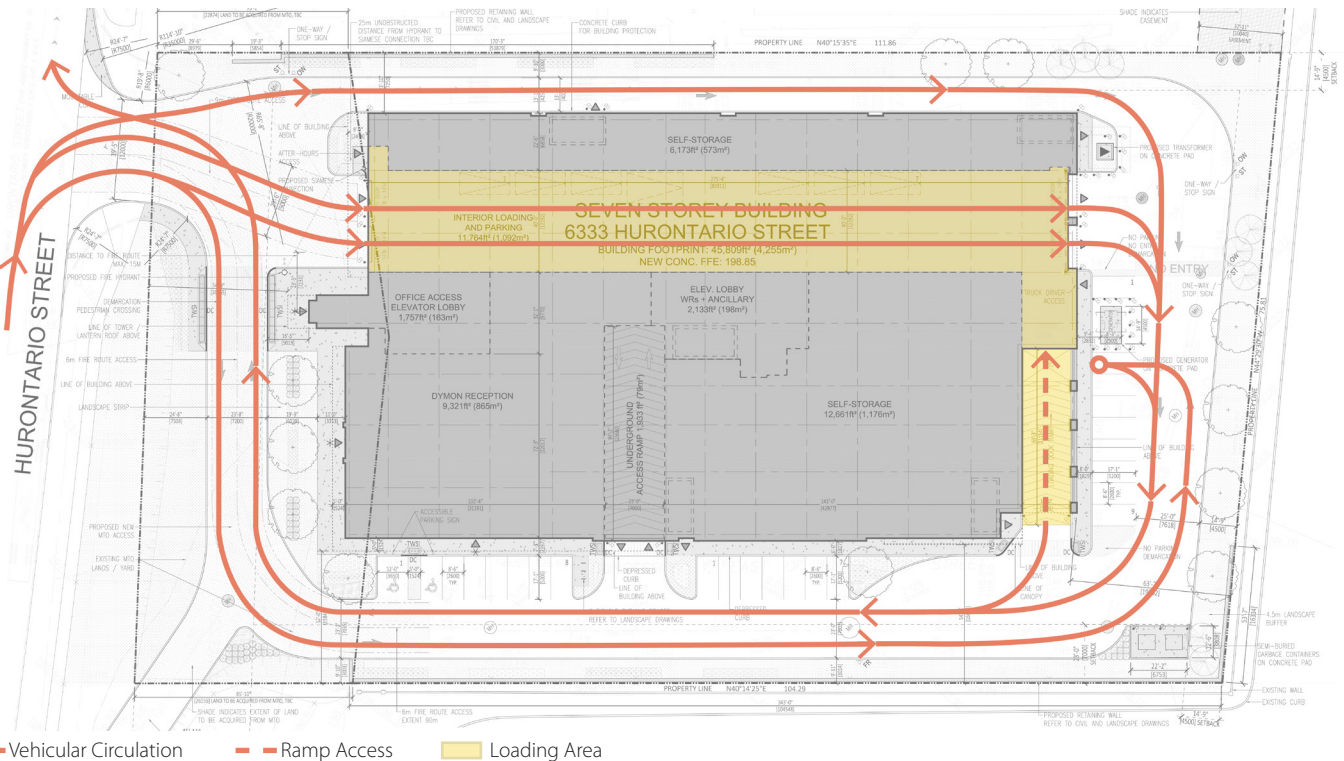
Loading and waste storage area on ground level, illustrating access route circulation. Base plan by Nicolas Caragianis Architect
